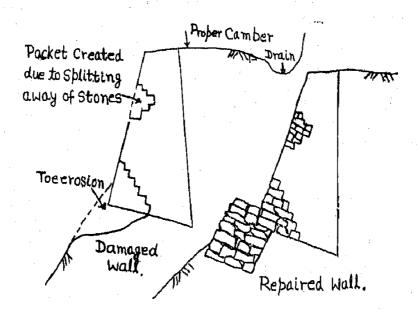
Repair of retaining wall affected by erosion or loss of stones
